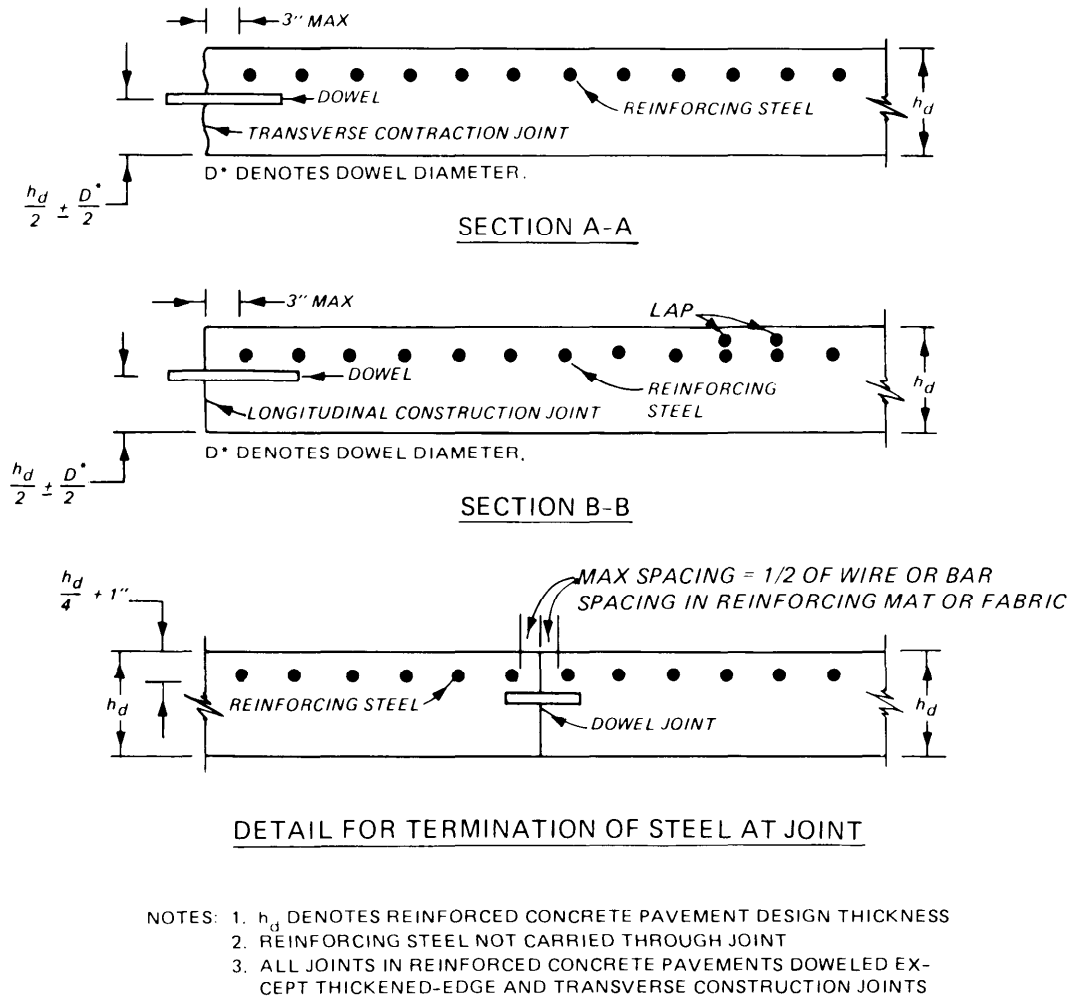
Reinforcing steel details. (Sheet 2 of 2)
